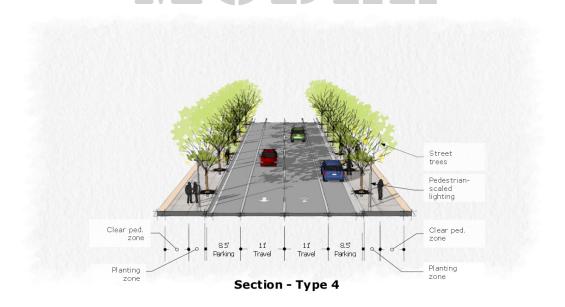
Configuration and dimensional requirements for street section Type 4 areas identified in the Street Section Plan.
